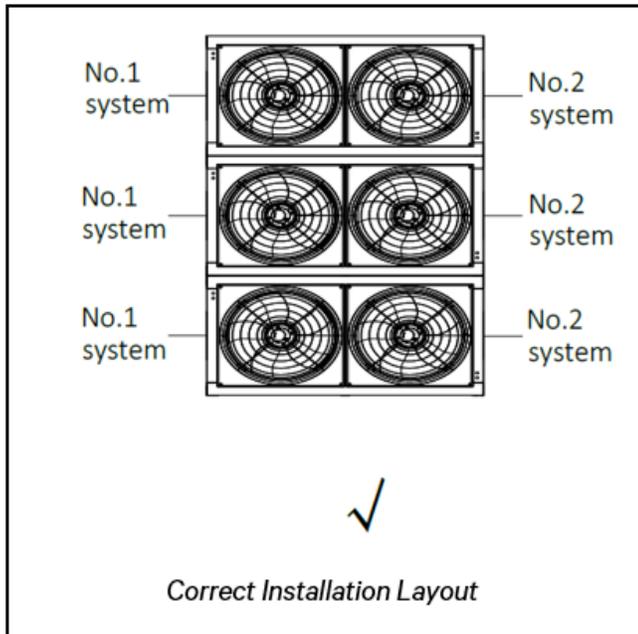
Front-and-Back Side by Side Installation Layout Overhead View
